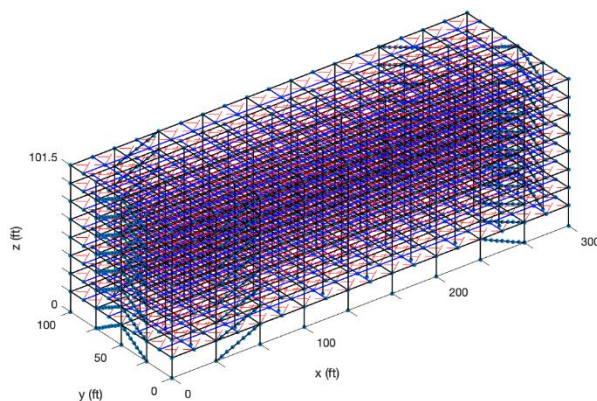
Isometric elevation of SDII building archetype with CBF braced frames (Foroughi, et al., 2021).
